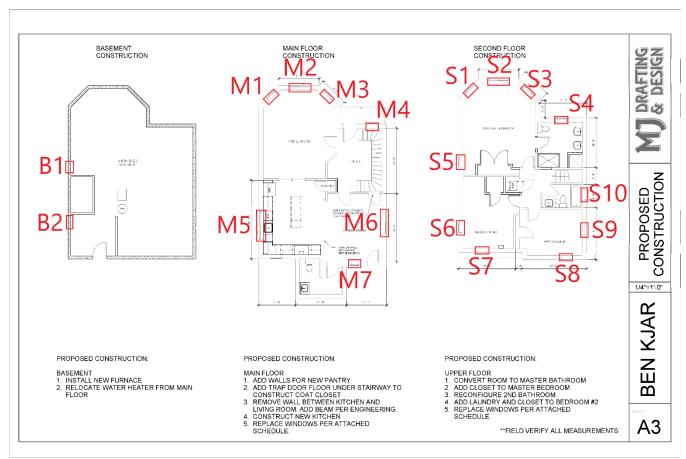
Floor plan submitted by Applicant with Staff annotations of replaced windows.
